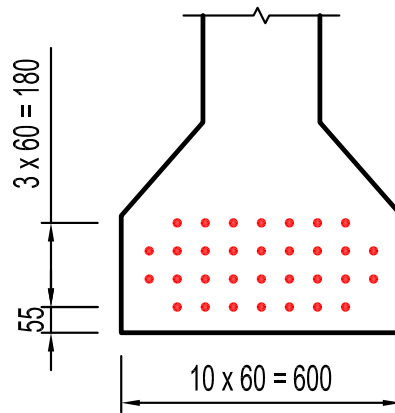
Prestressing strand layout in precast concrete girders. Note: All dimensions are in centimeters. 1 cm = 0.3937 in.
